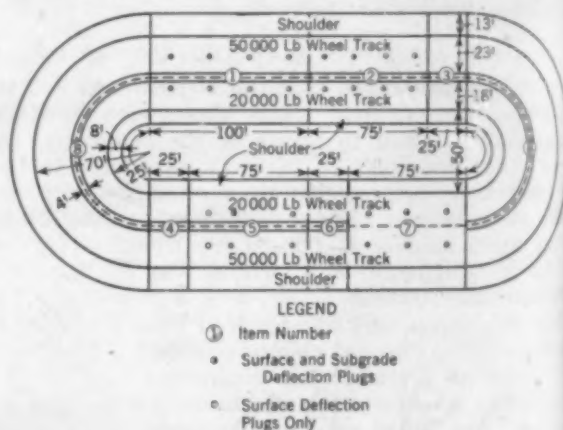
LAYOUT FOR ACCELERATED TRAFFIC TESTS, BARKSDALE FIELD
